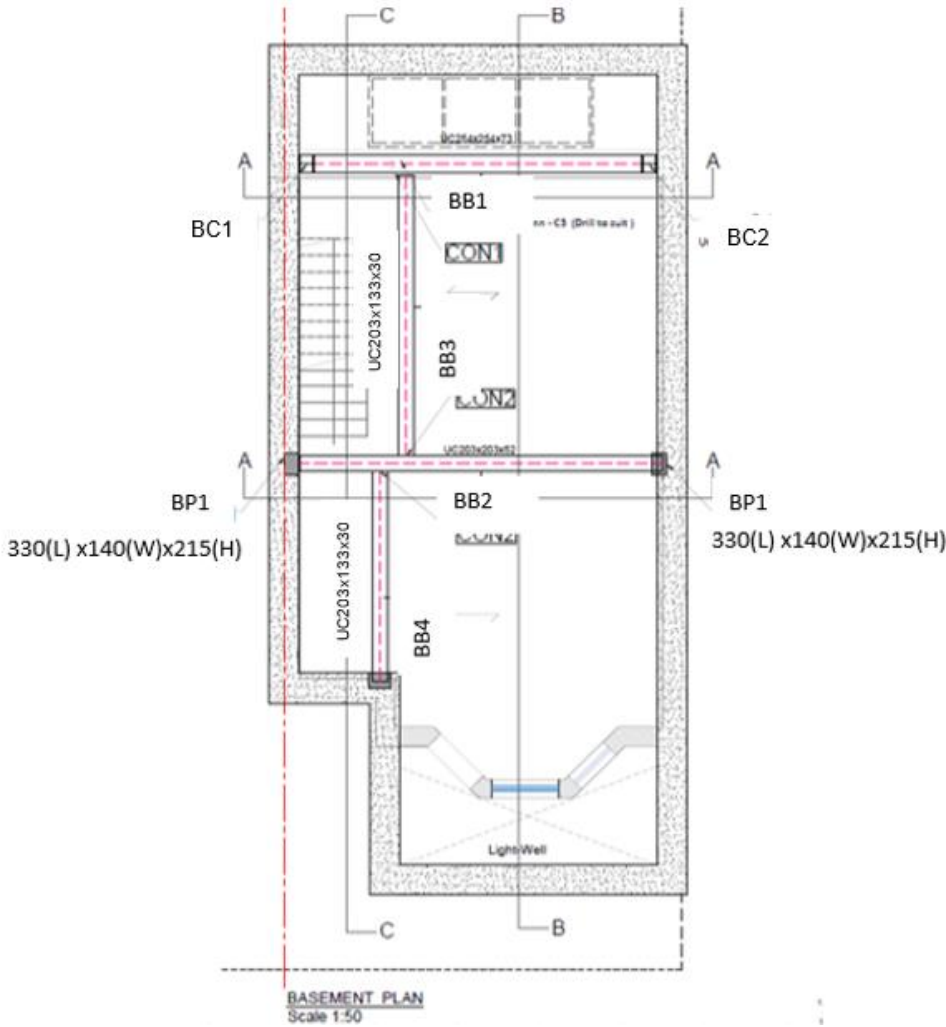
Location of Steel Beams on Plan showing Padstone BP1
